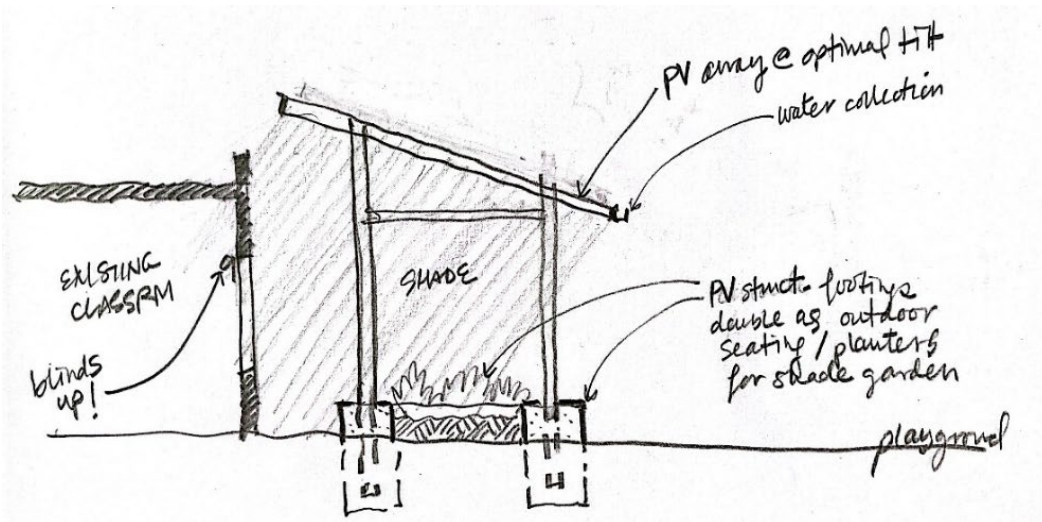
Free-standing photovoltaic structure with water collection, providing shade to garden beds and the west-facing classroom beyond.
